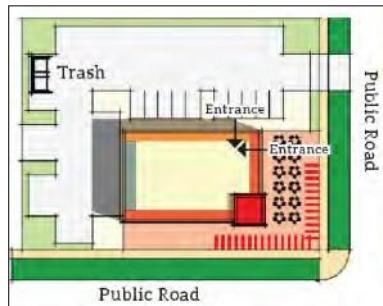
Option No. 1 Site layout for a building that fronts on a public roadway.
